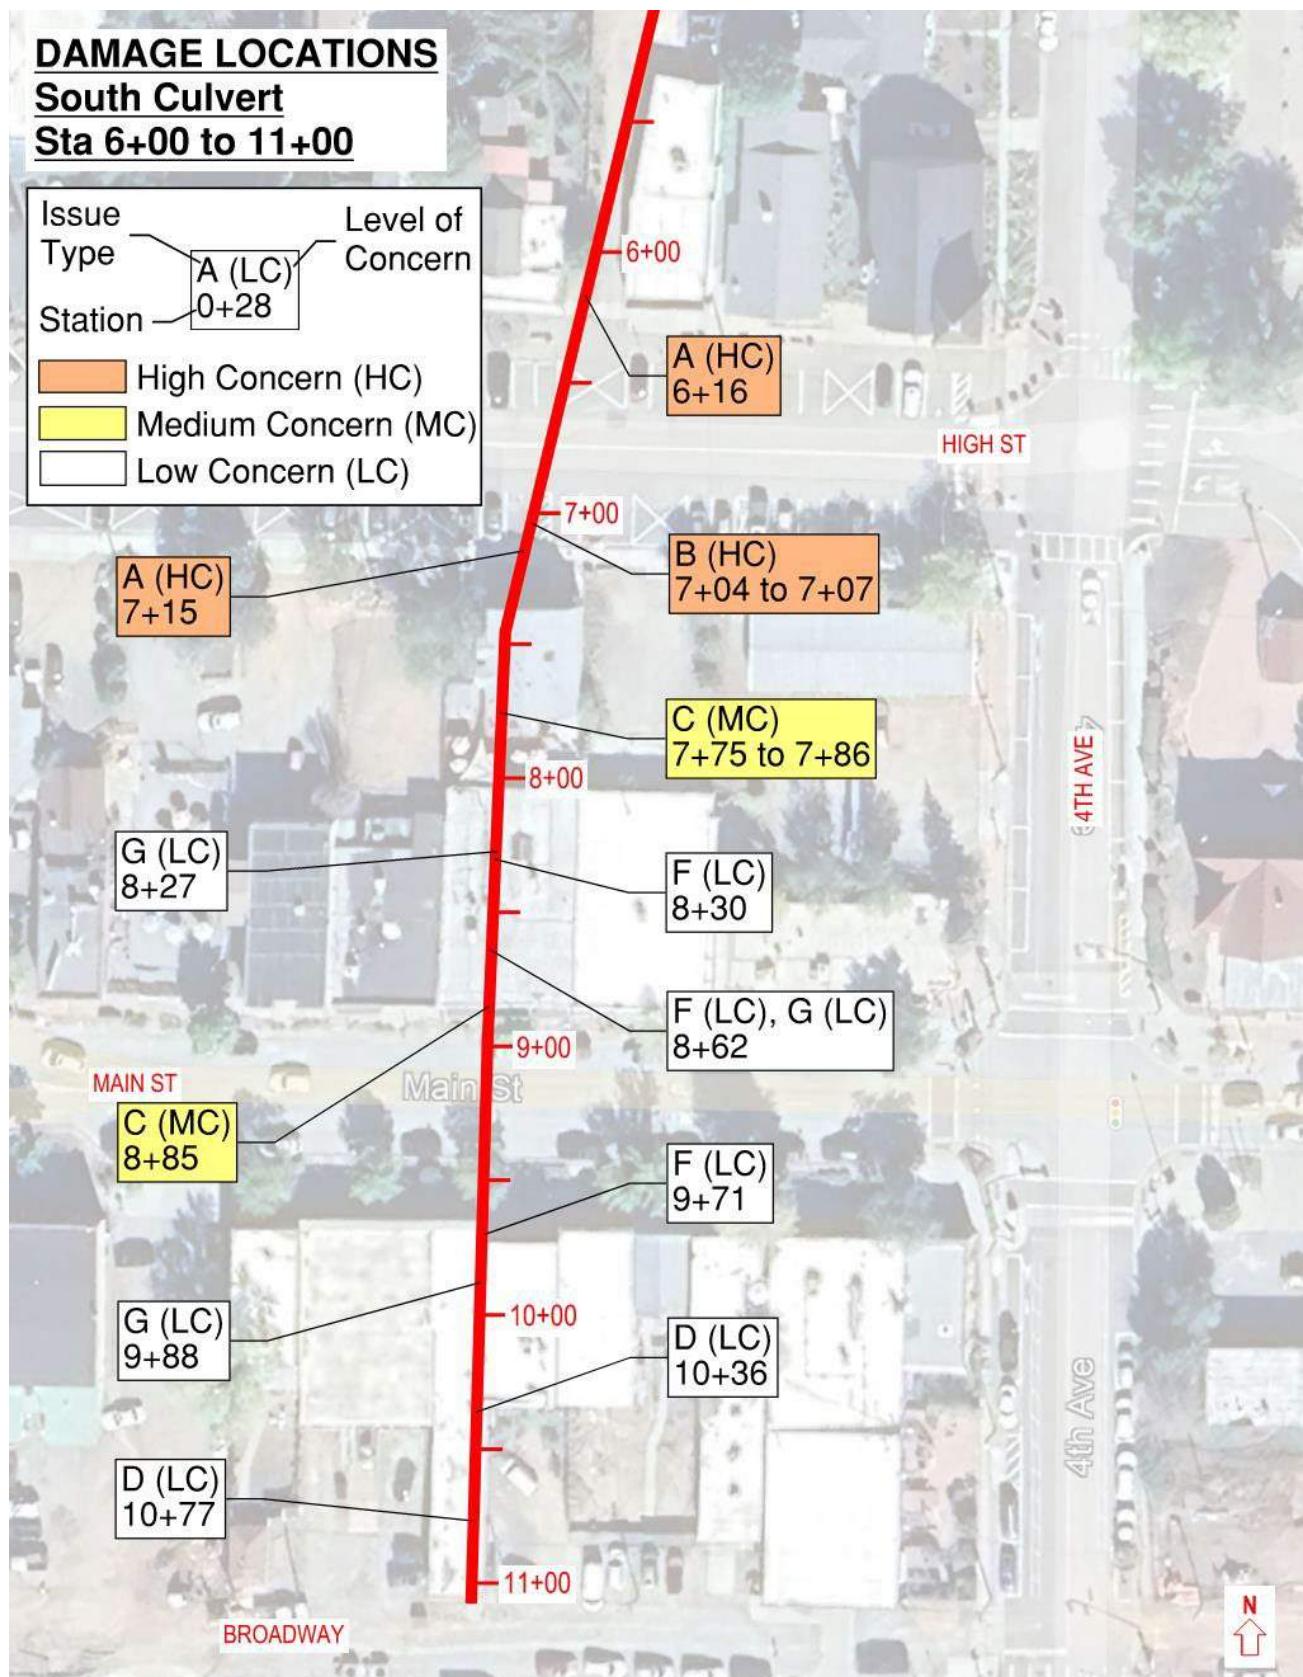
South Culvert Map of Damaged/Deteriorated Areas Stations (S)6+00 to (S)11+00
